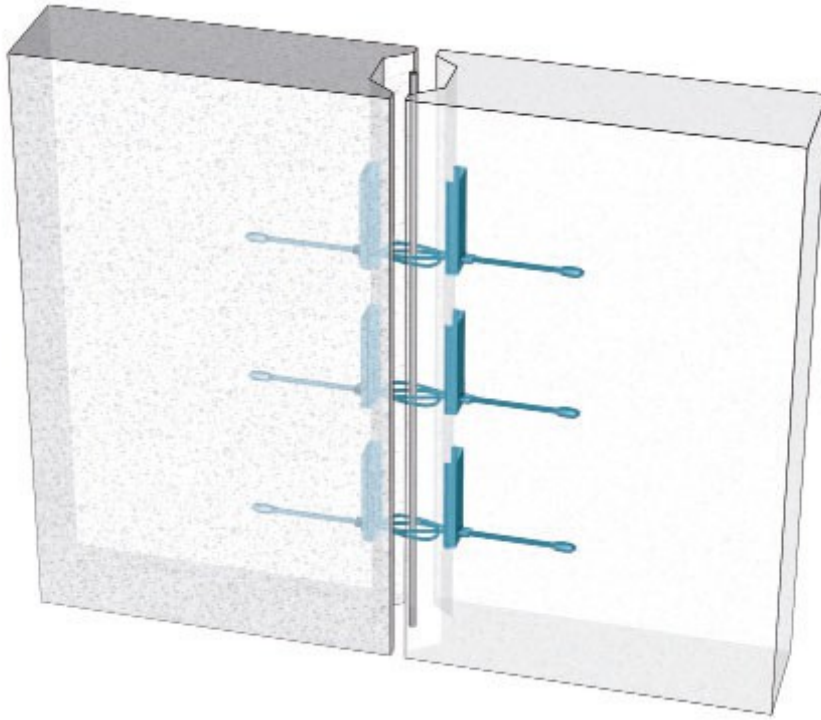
PVL Connecting Loops in the joint of wall panels
